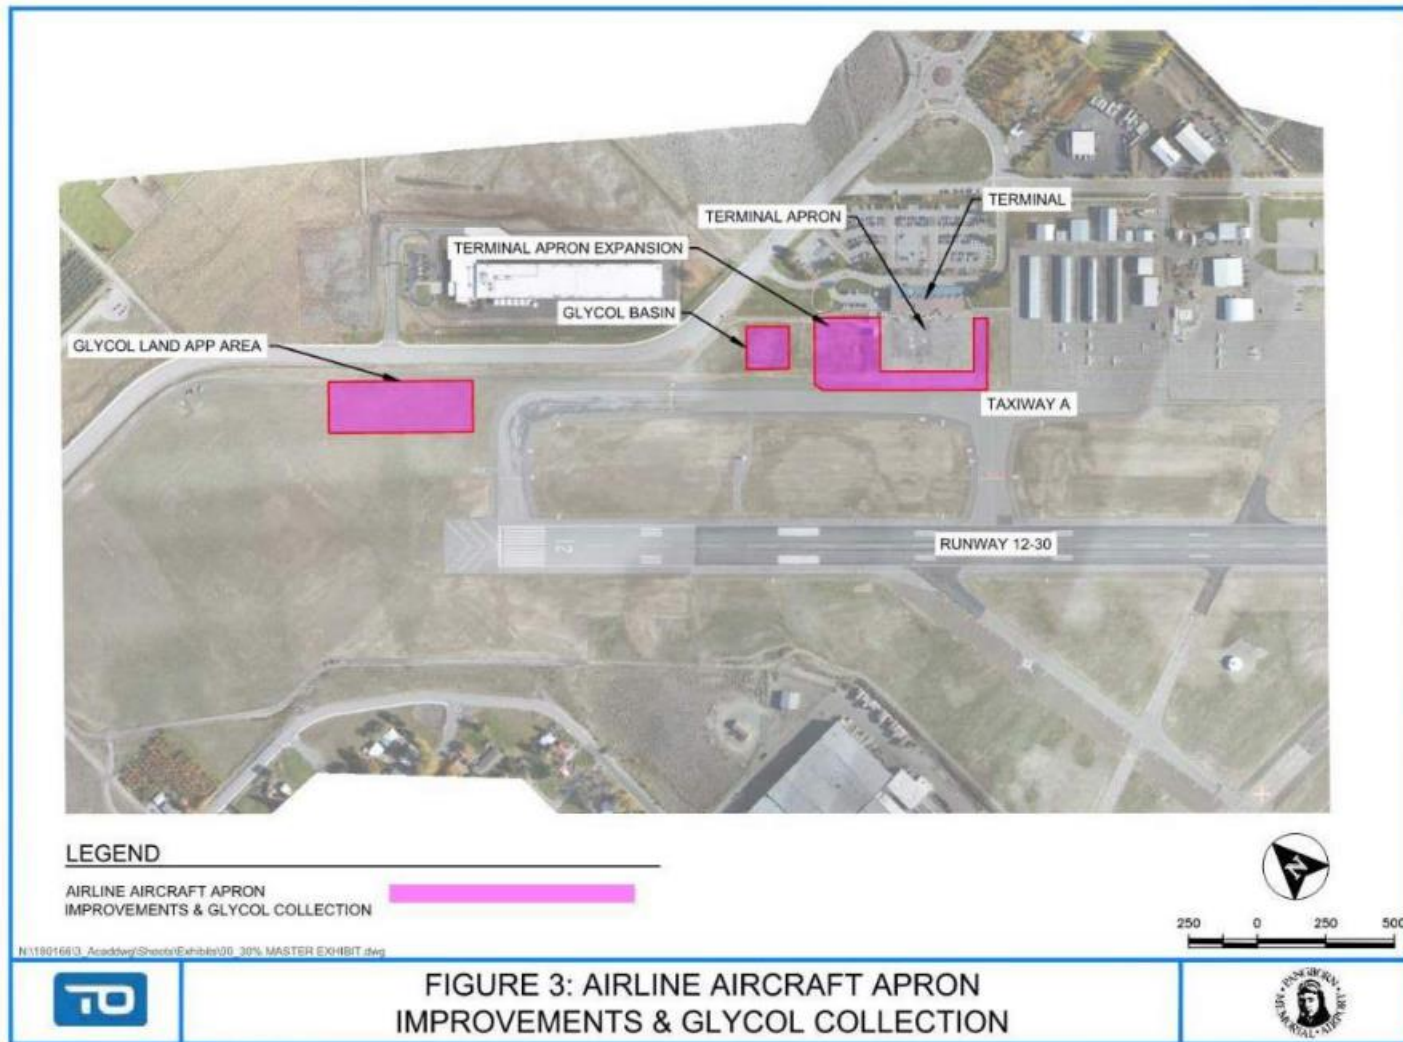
Airline Aircraft Apron Improvements & Glycol Collection, adapted from Proposed Improvements Exhibit, (dated 1/29/21)
